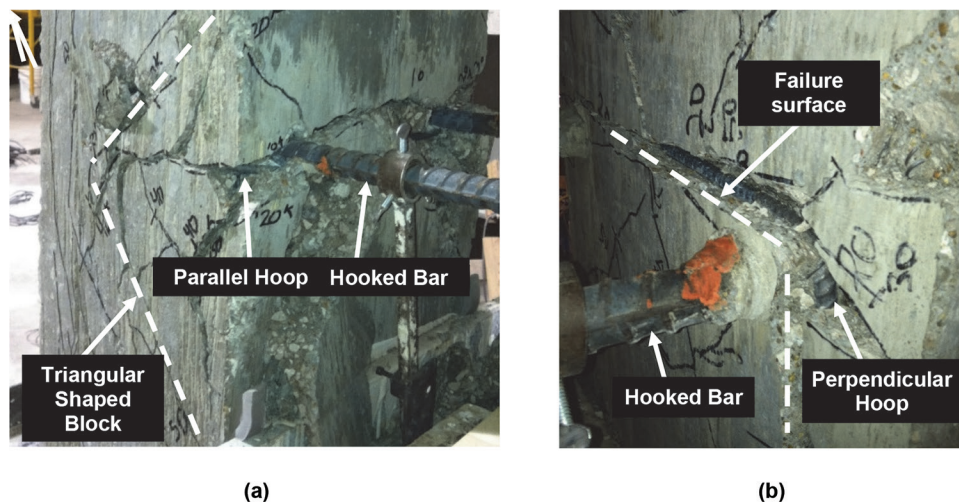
Failure modes of specimens with 90-degree hooked bars with different orientations of confining reinforcement: (a) hoops parallel to straight portion of hooked bars pinning triangular-shaped block to compression zone; and (b) hoops perpendicular to straight portion of hooked bar with concrete block being pulled toward front of column.
